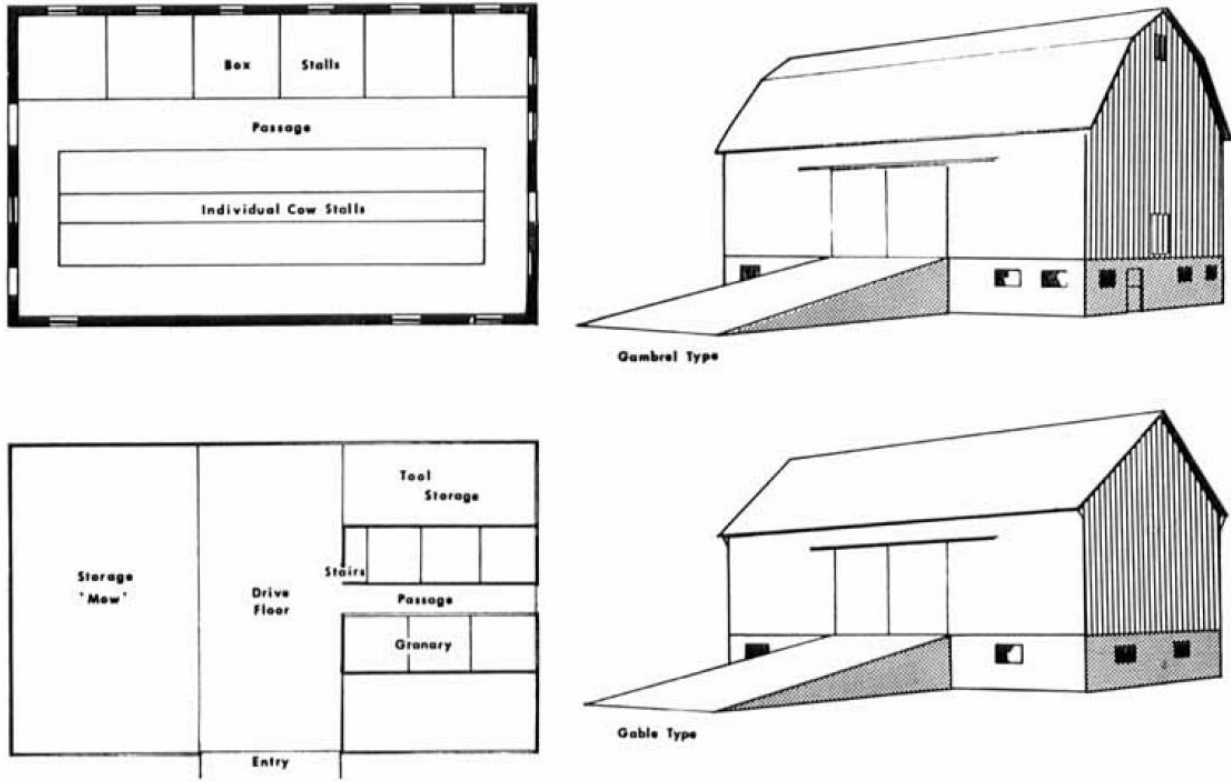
The Central Ontario Barn, as defined by Ennals (1972: 257) and second level plan
